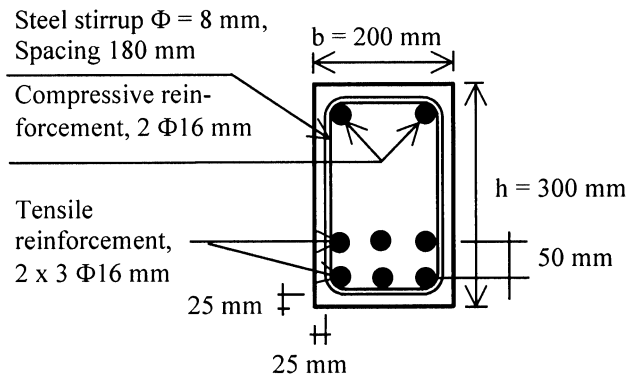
Details of the reinforcement in  $200 \times 300 \times 3800$  mm beam.
